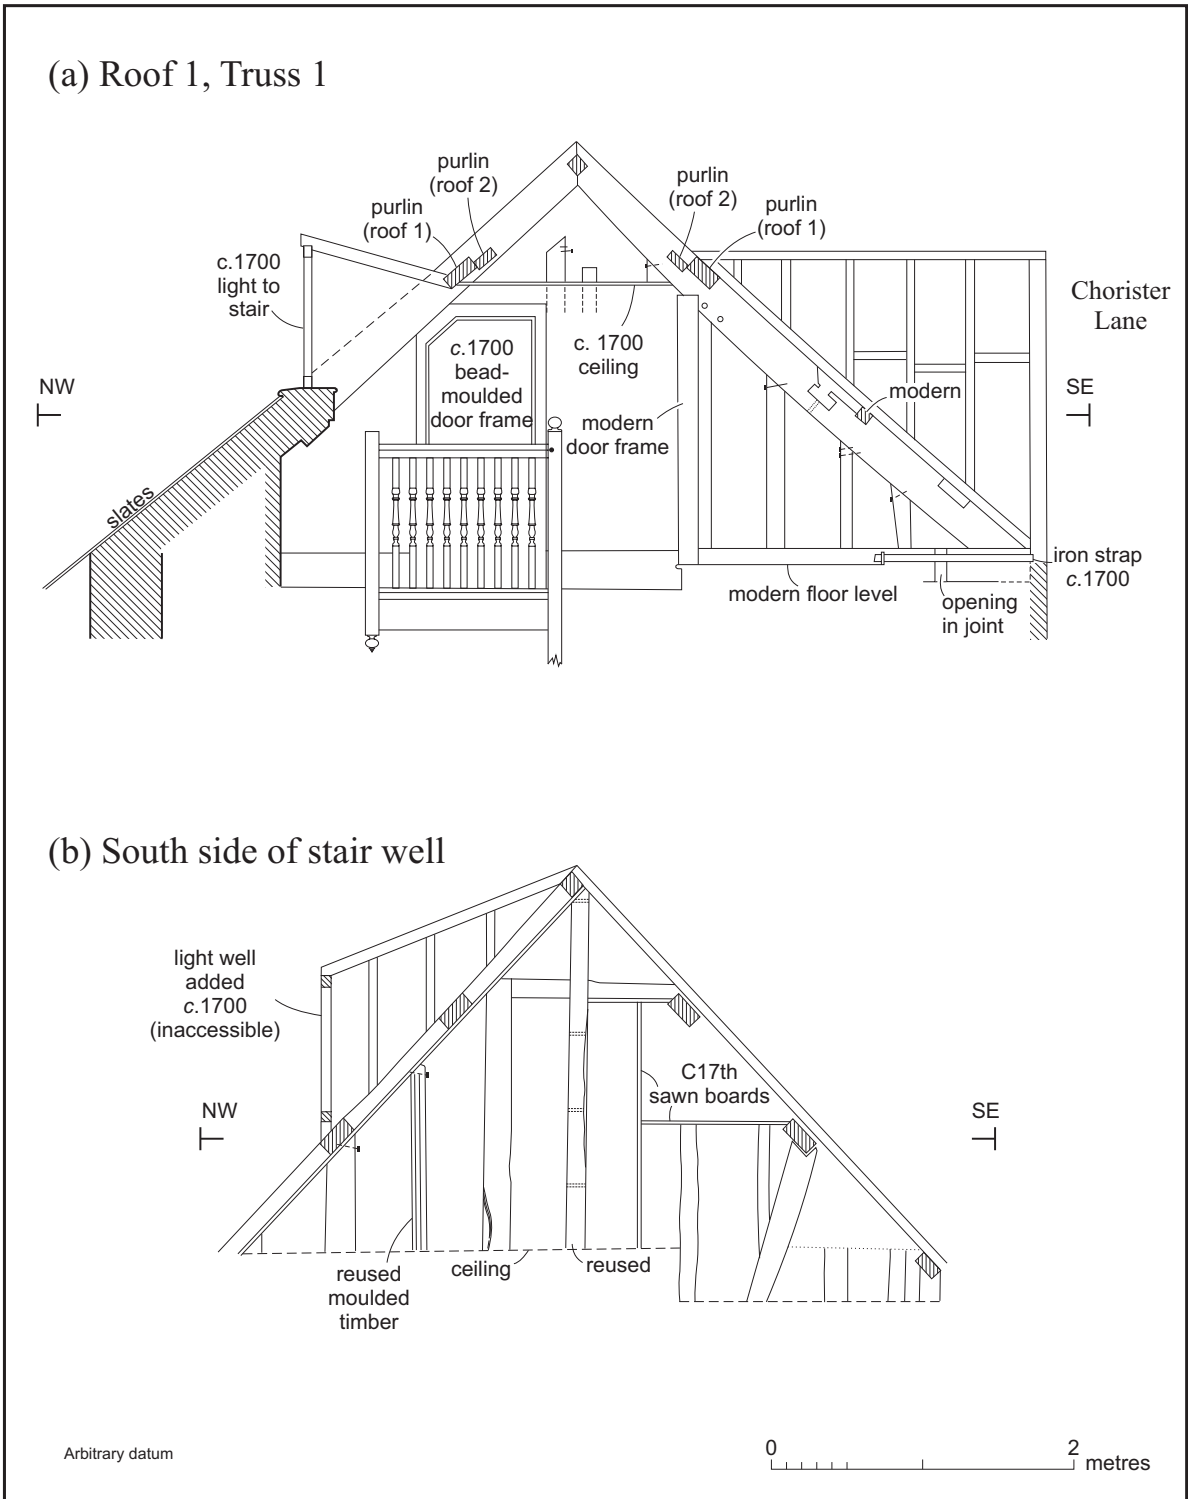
Roof 1. (a). Measured elevation of the closed Truss 1 from SW, with 17th-century and later additions on each roof-slope. (b). Measured elevation of 17th-century framing.
